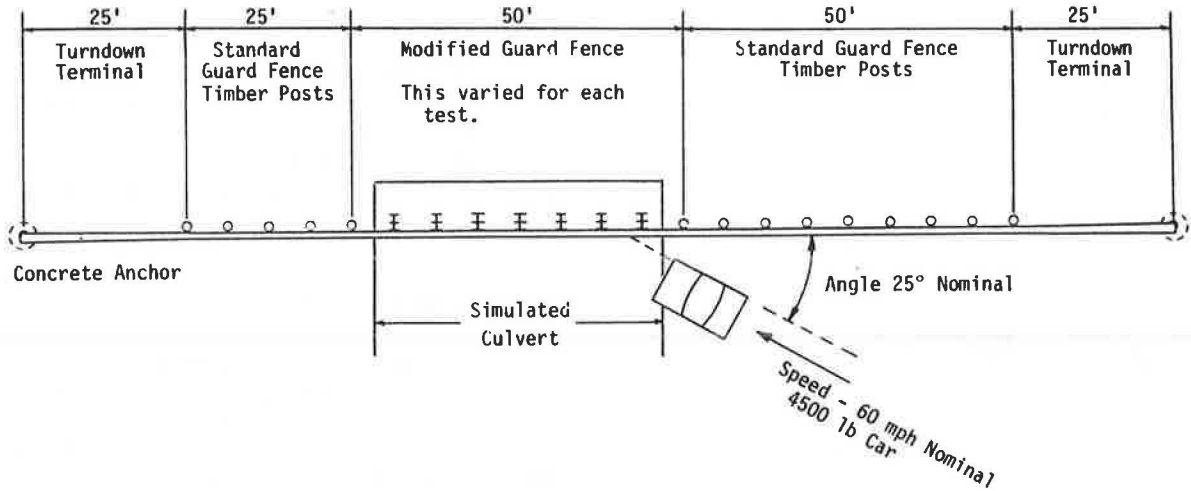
Plan view of typical crash test site for Tests 1, 2, and 3.
